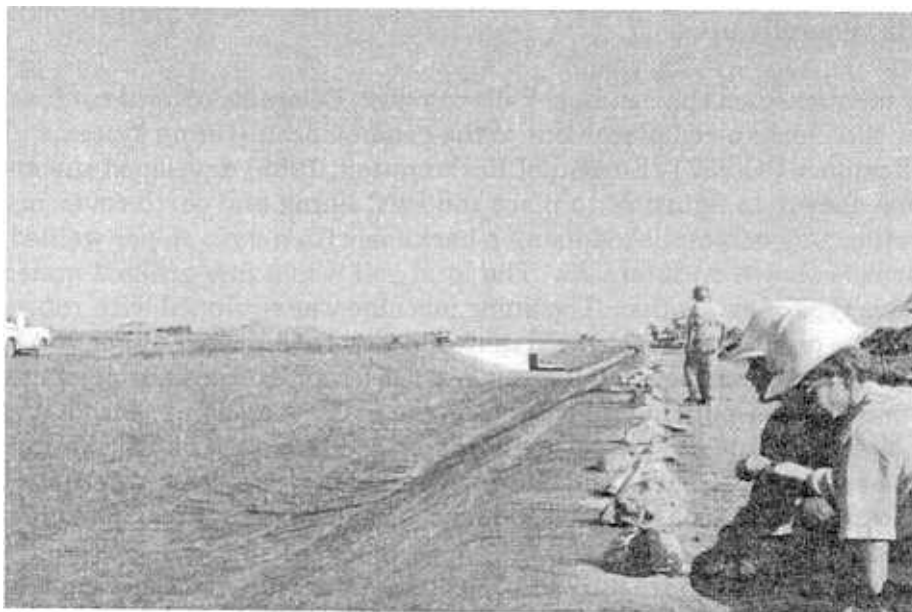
View of sandbags used to temporarily anchor PVC geomembrane on canal berm.
